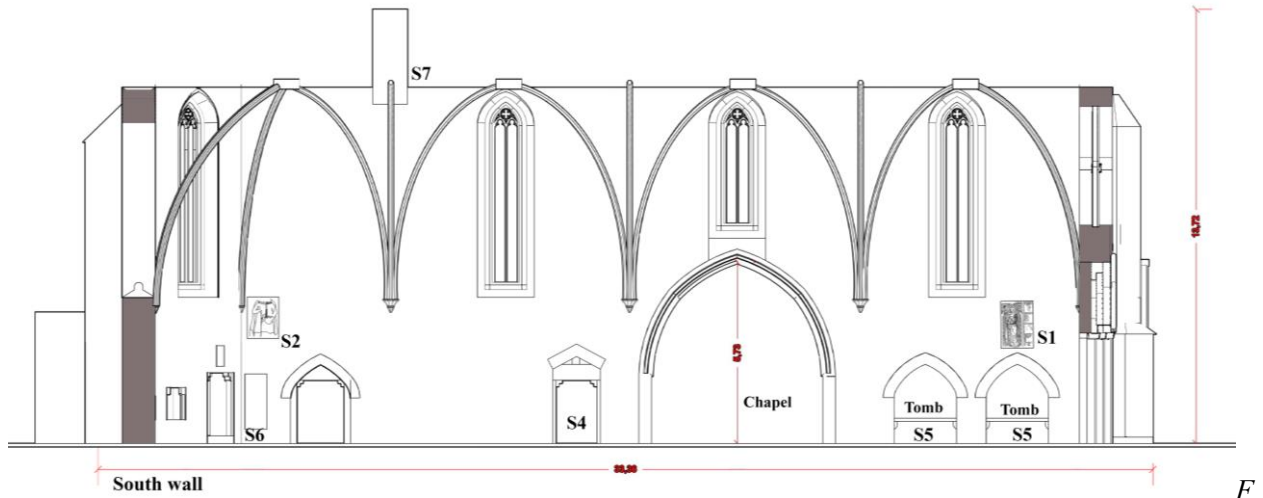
Painting on the South wall of the church. Image by Rokhsaneh Rahbarianyazd.
